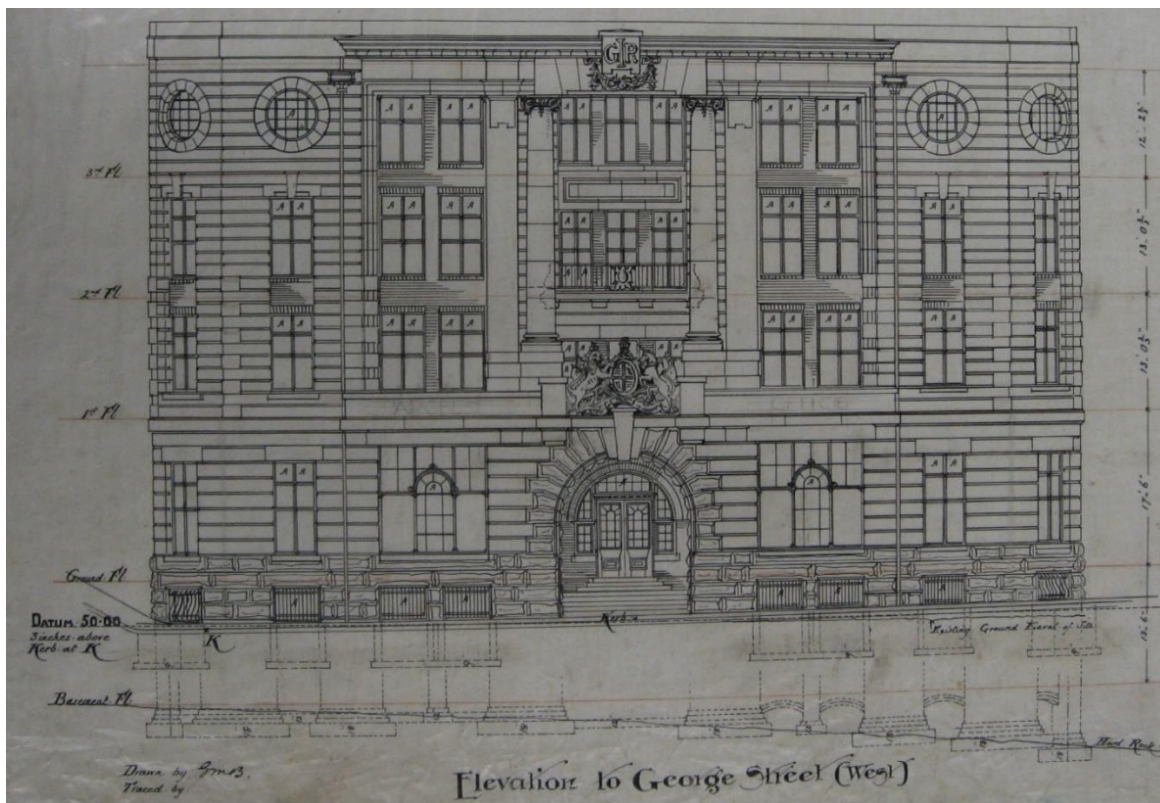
Detail from Sheet 4, Elevation to George Street (west): New Parcels Post Office Premises at the Central Railway Station Sydney, 1910 (showing the original four storey elevation).
